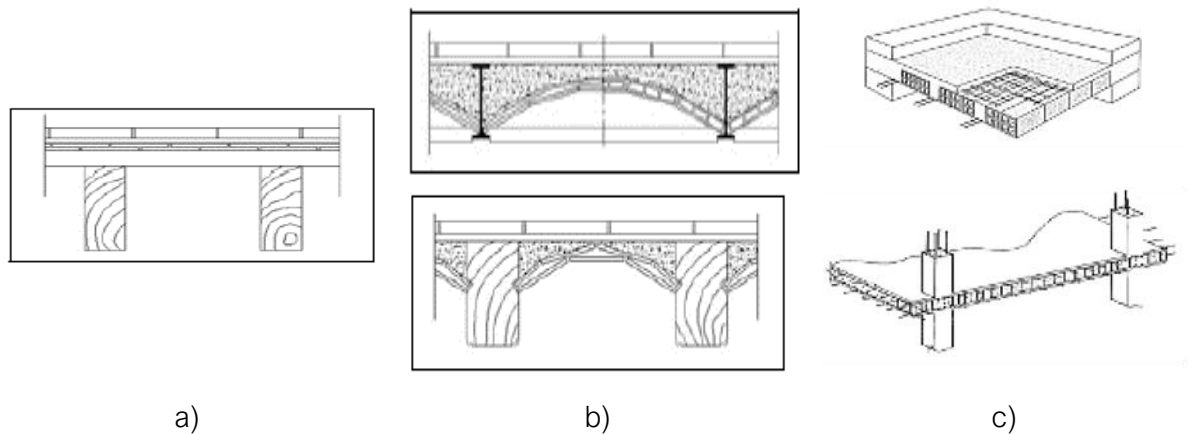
Different horizontal diaphragms considering their in-plane stiffness: a) flexible floor system (timber beams and wooden planks); b) semi-flexible floor system (timber/steel beams and ceramic tile vaults) and c) rigid floor system (reinforced concrete slab/ floor slab with ceramic blocks and a compressive layer of concrete).
